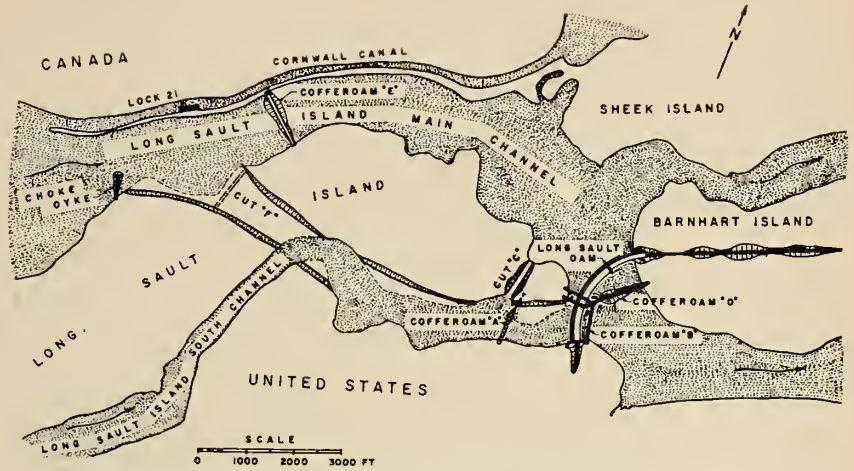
General plan of cofferdam 'E' and structures in vicinity.
